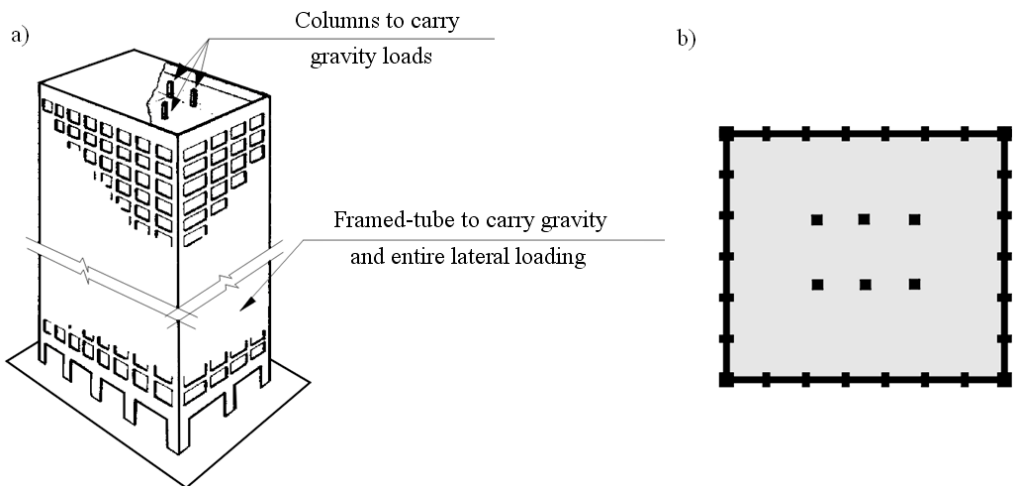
Framed-tube structure [2]: a) general view of structure, b) floor plan of structure
